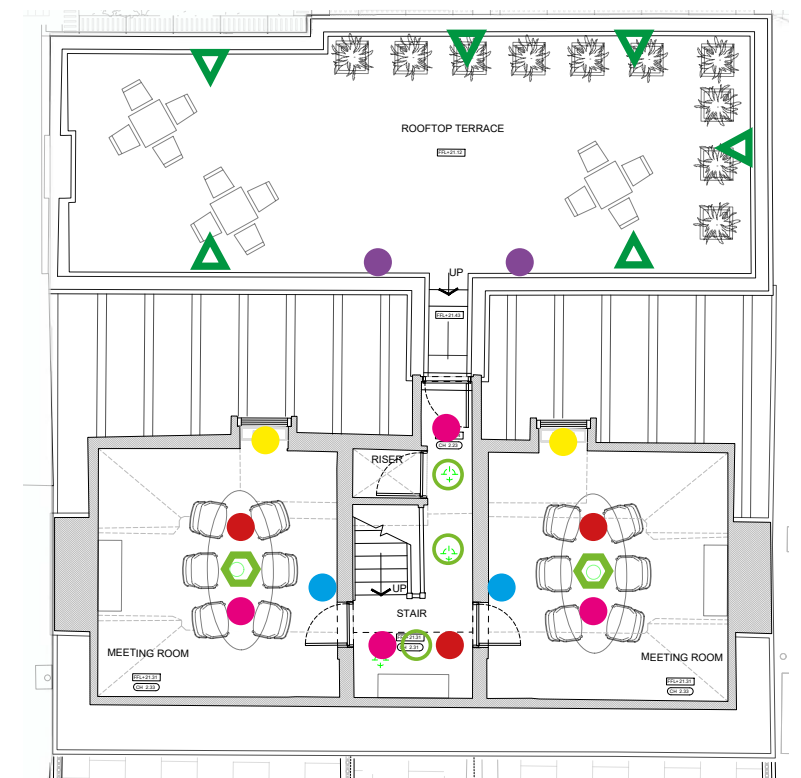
Proposed Lighting and CCTV - Third Floor
